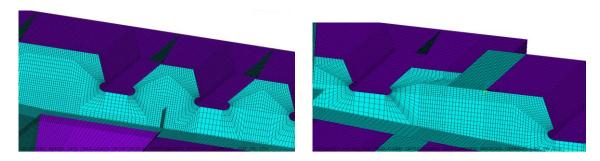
Left, connection of cross-beam to main girder. Right, connection of deck plate to pedestrian road.
